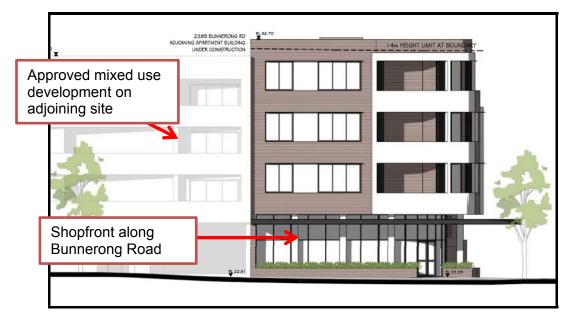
Proposed Bunnerong Rd (east) Elevation (Source: Zhinarchitects, Issue B March 2017)
